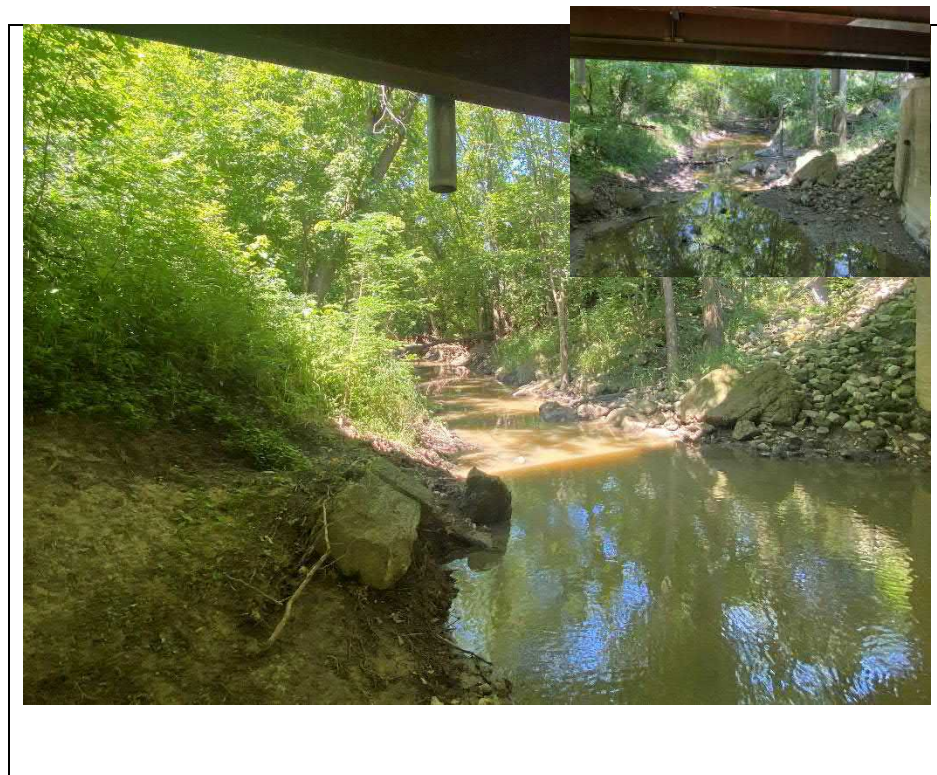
Embankments at northeast quadrant of structure (Looking East)
